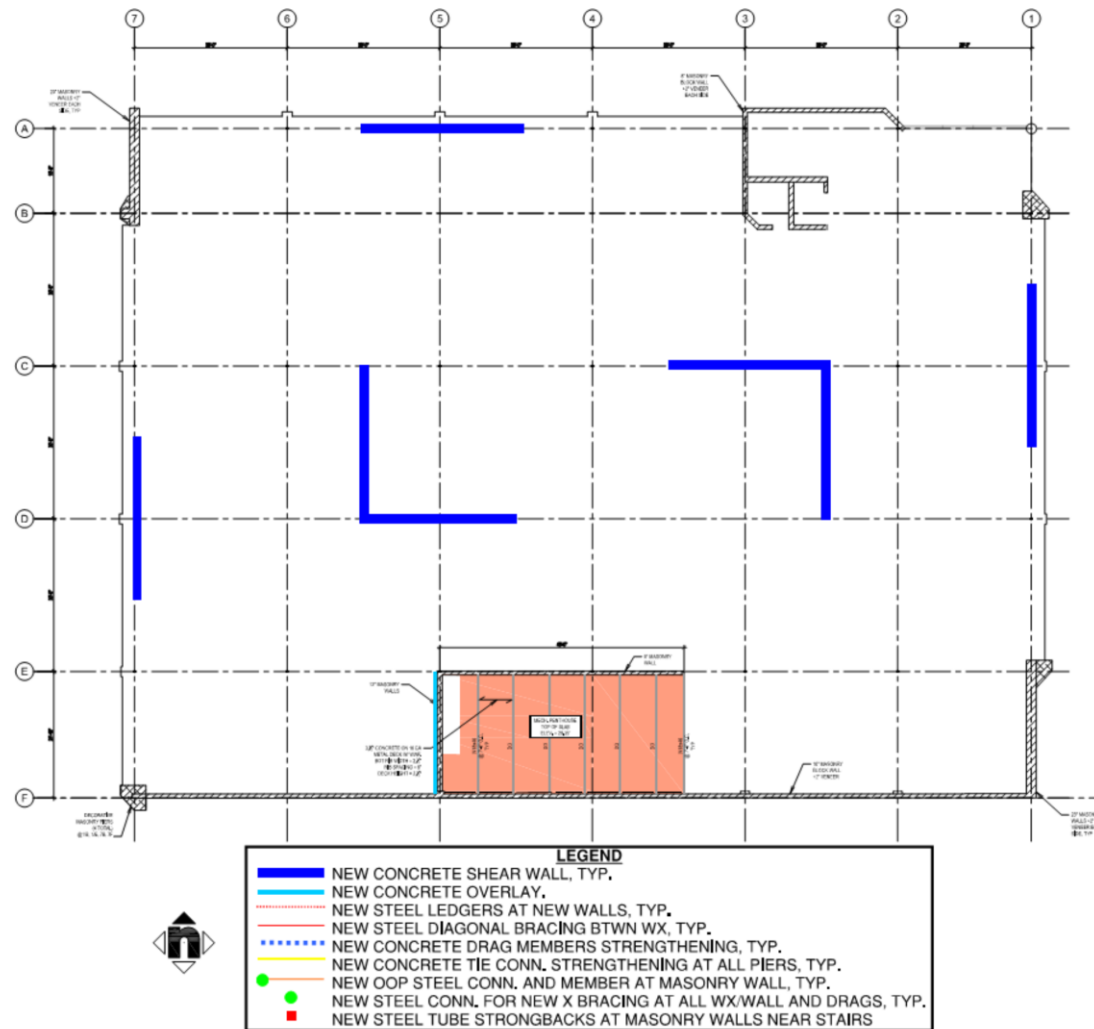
Option No. 2 – Mezzanine Level Strengthening
